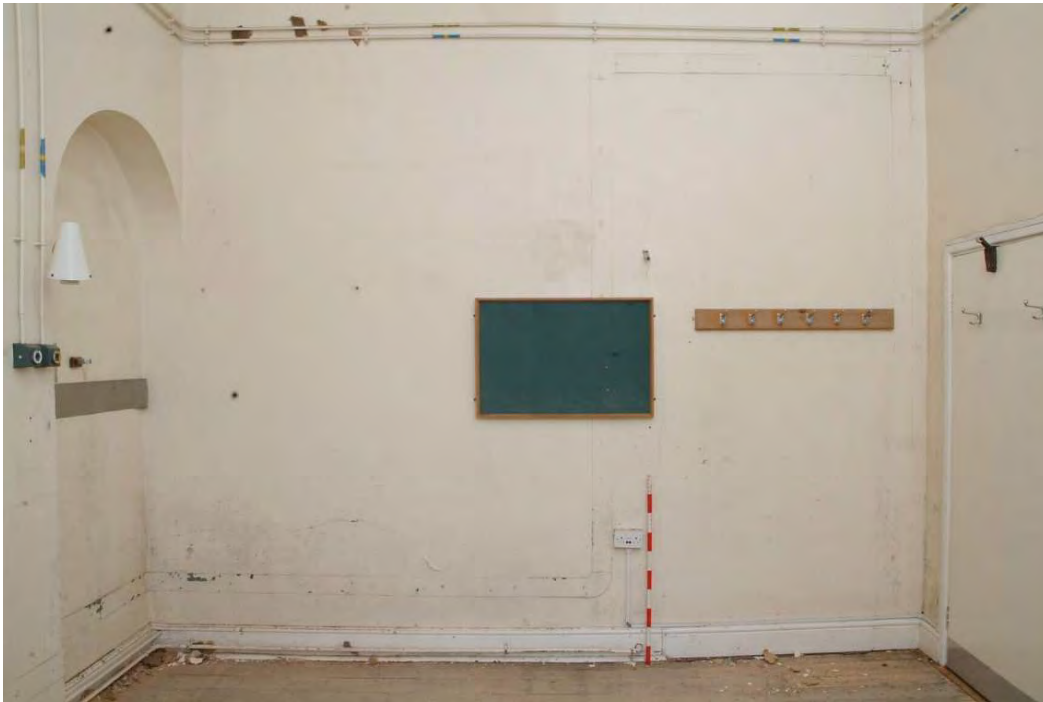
Building 24 (FF): west wall of ward [Room 2.26] showing blocked door, view to the south
